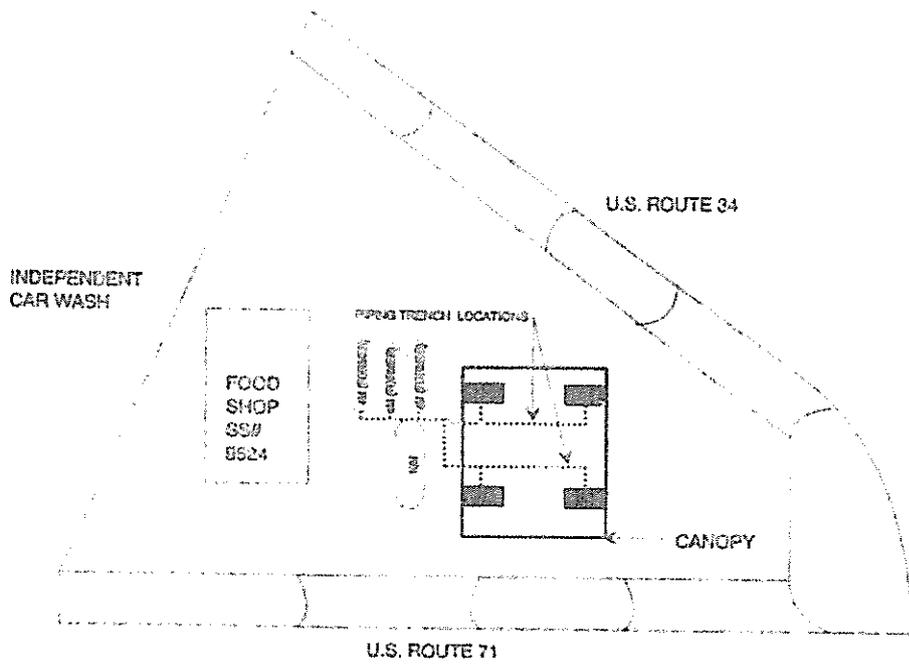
A - PIPING TRENCH LOCATION DIAGRAM
